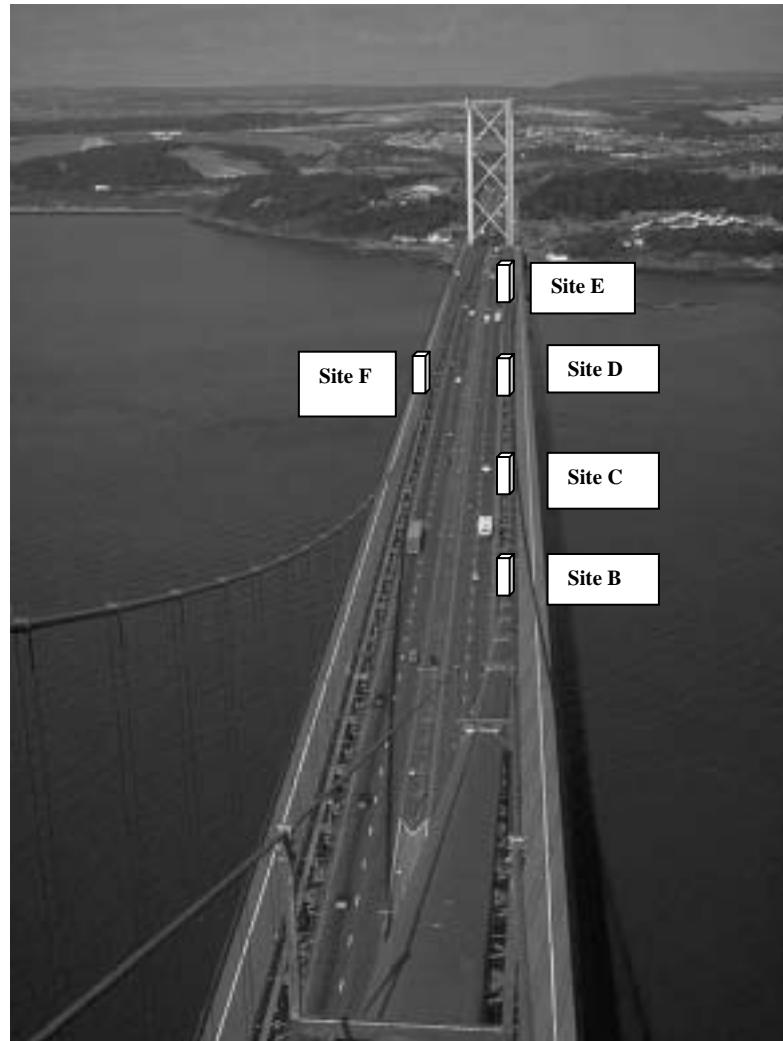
Plan-view of the Forth Road Bridge and the locations of monitoring stations B – F.
